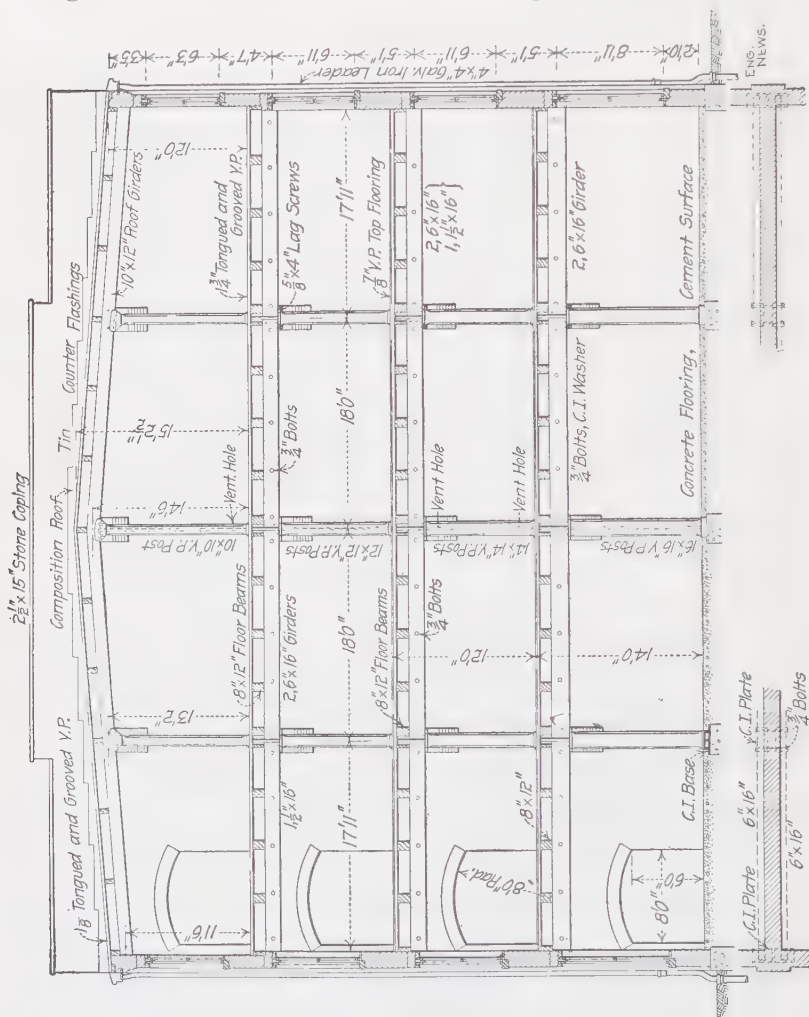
Transverse Section of Pattern Building, New Worthington Hydraulic Works.
